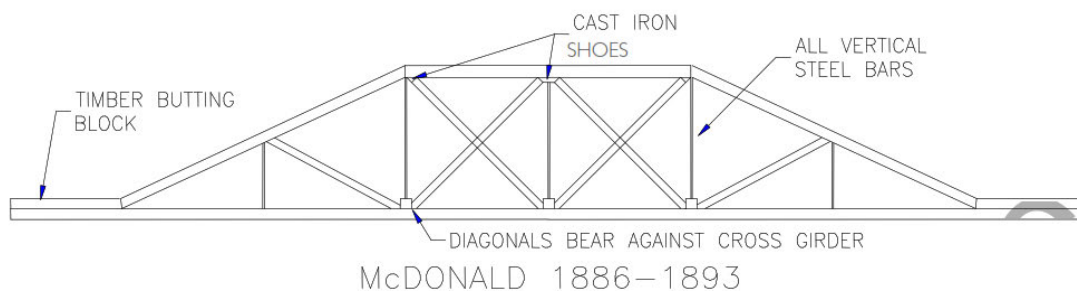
McDonald Truss. (Source: Timber Bridge Manual, 2008)
